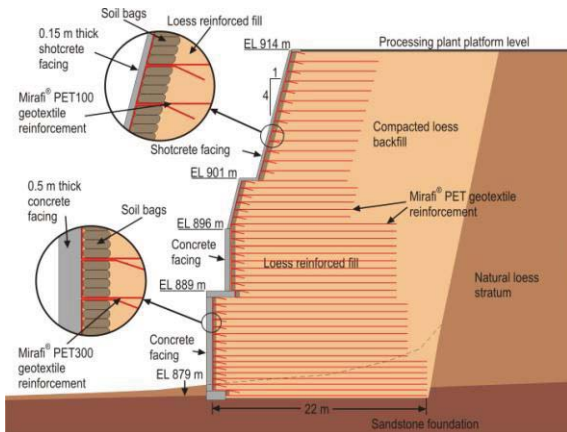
Cross-section of reinforced soil wall at the highest section of the wall
